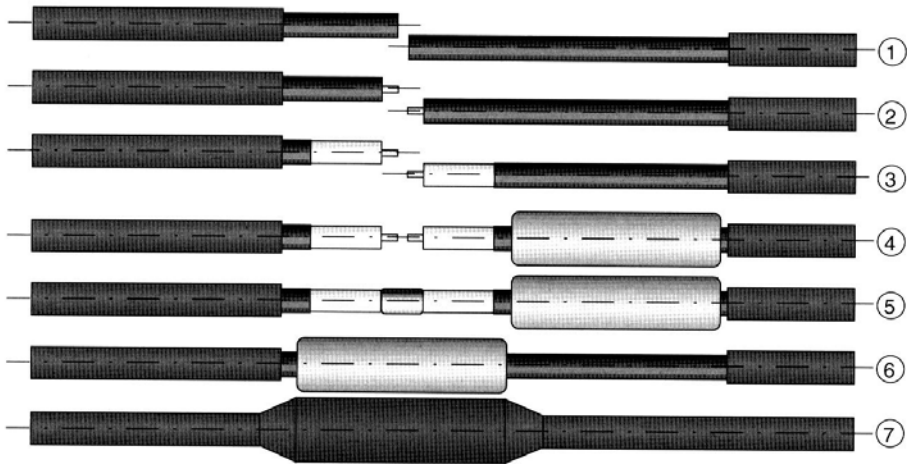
steps connecting the ends of EHV cables using prefabricated joints
